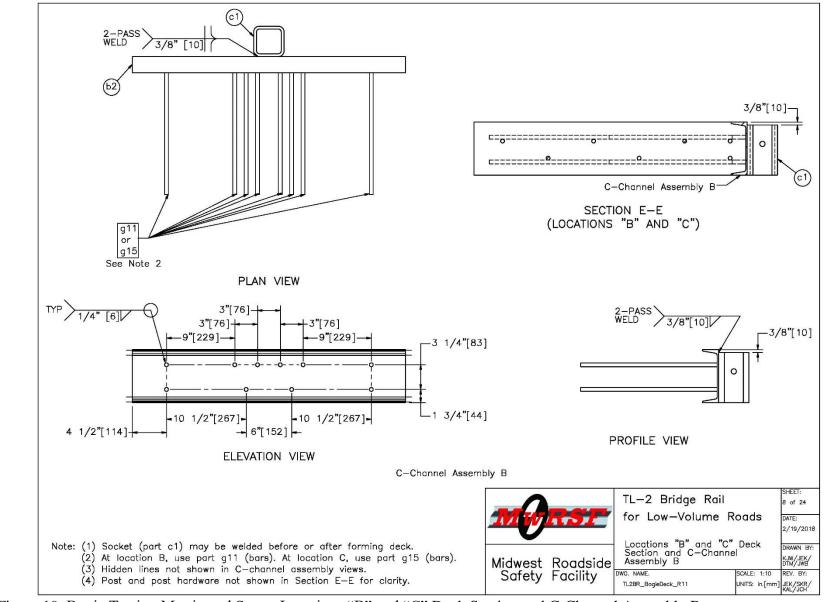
Bogie Testing Matrix and Setup, Locations "B" and "C" Deck Section and C-Channel Assembly B
